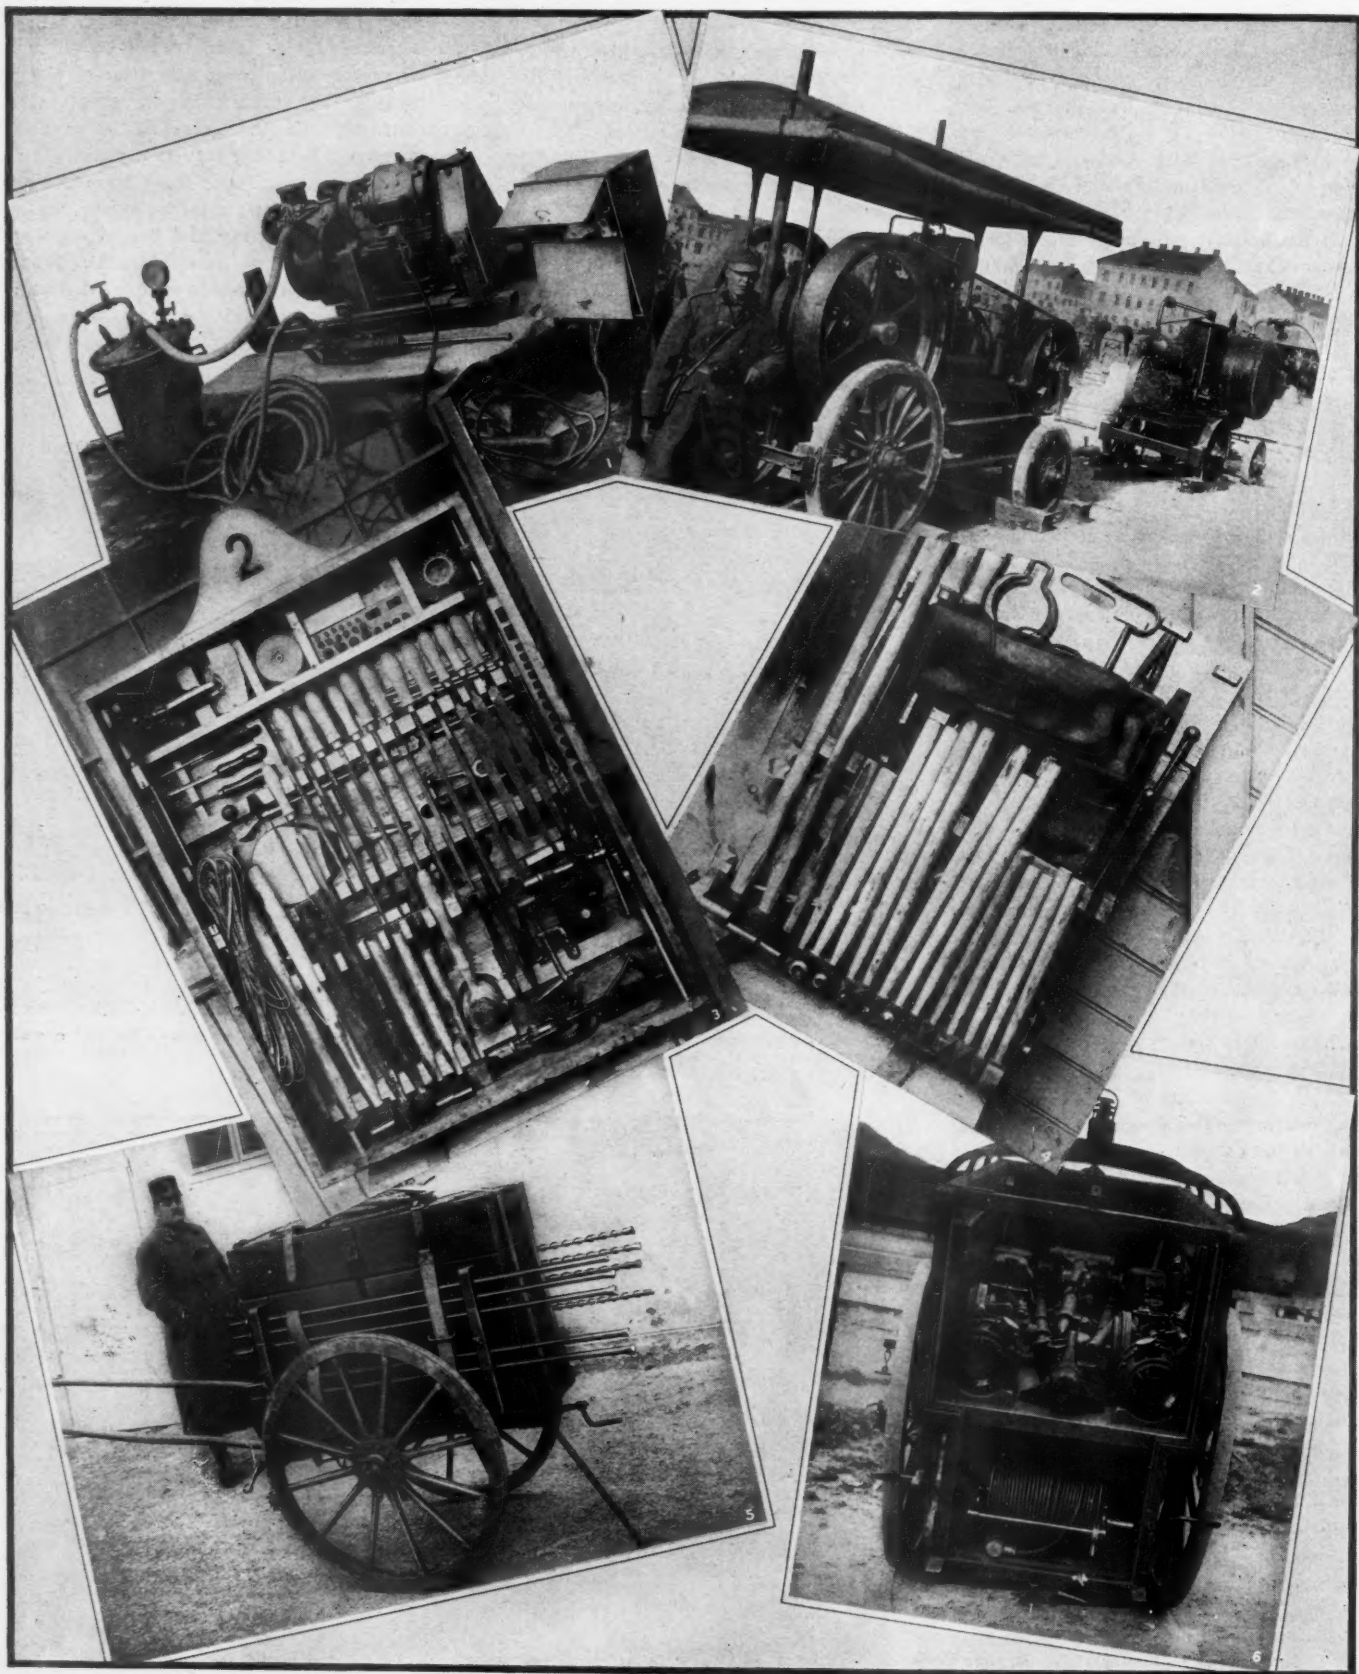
A sectional electric compressor with accessories, built by the Austrian Brown Boveri Works, a Swiss Company. Fig. 2—Three hammer plant with the same equipment as in Fig. 3. Lateral view. Fig. 4—Blacksmithing tools for Supply Cart No. 1. Fig. 5—Hose cart of an automobile drill was knocked down and loaded for transport. Fig. 6—Rock drill Cart No. 2, open, showing how a column's electric
